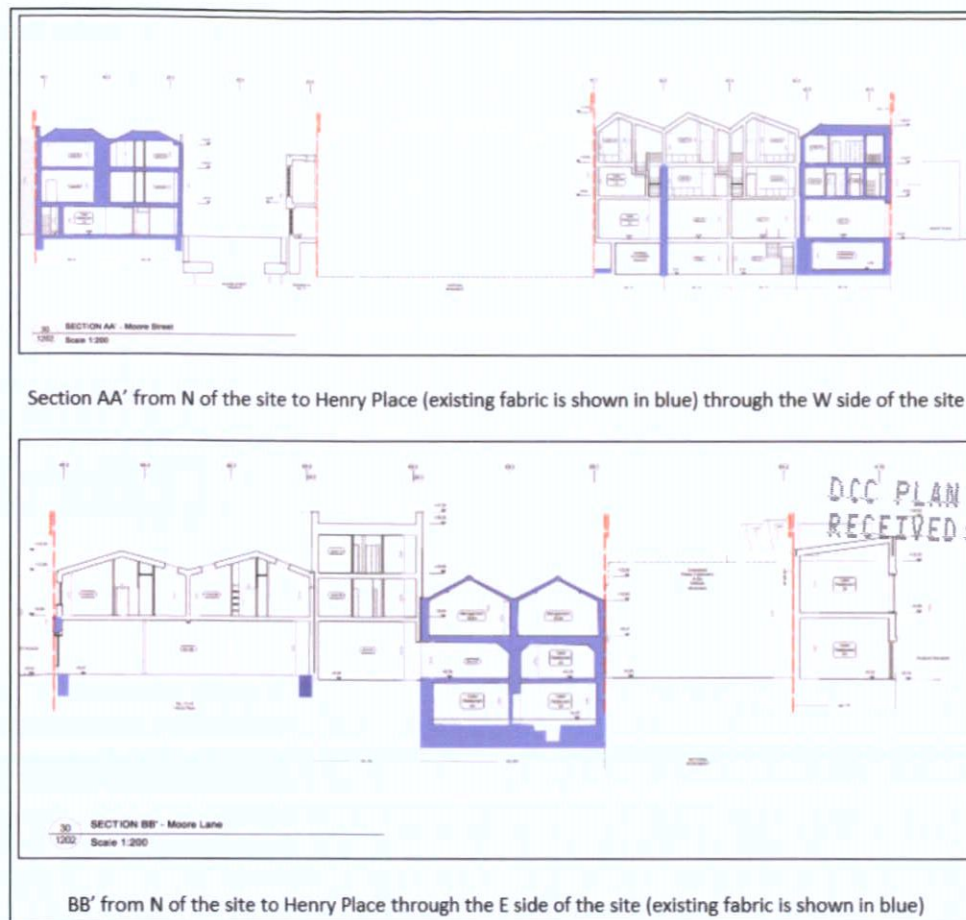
Section through Site 4 (Moore Street to Moore Lane) showing mini pile foundation strategy and basement levels.
